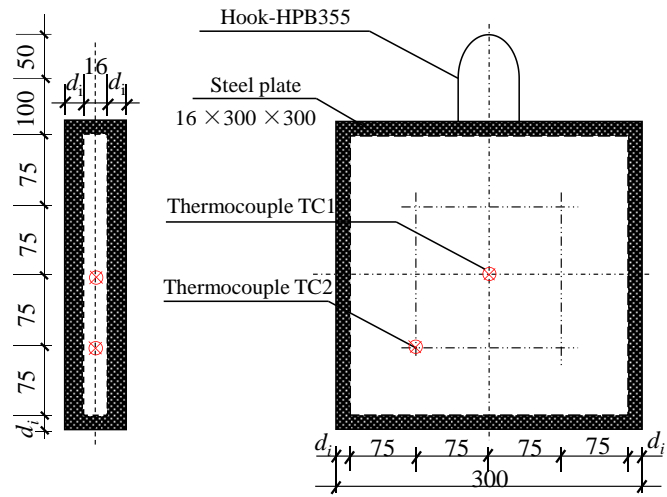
Details of test coupons and positions of thermocouples (unit: mm)
